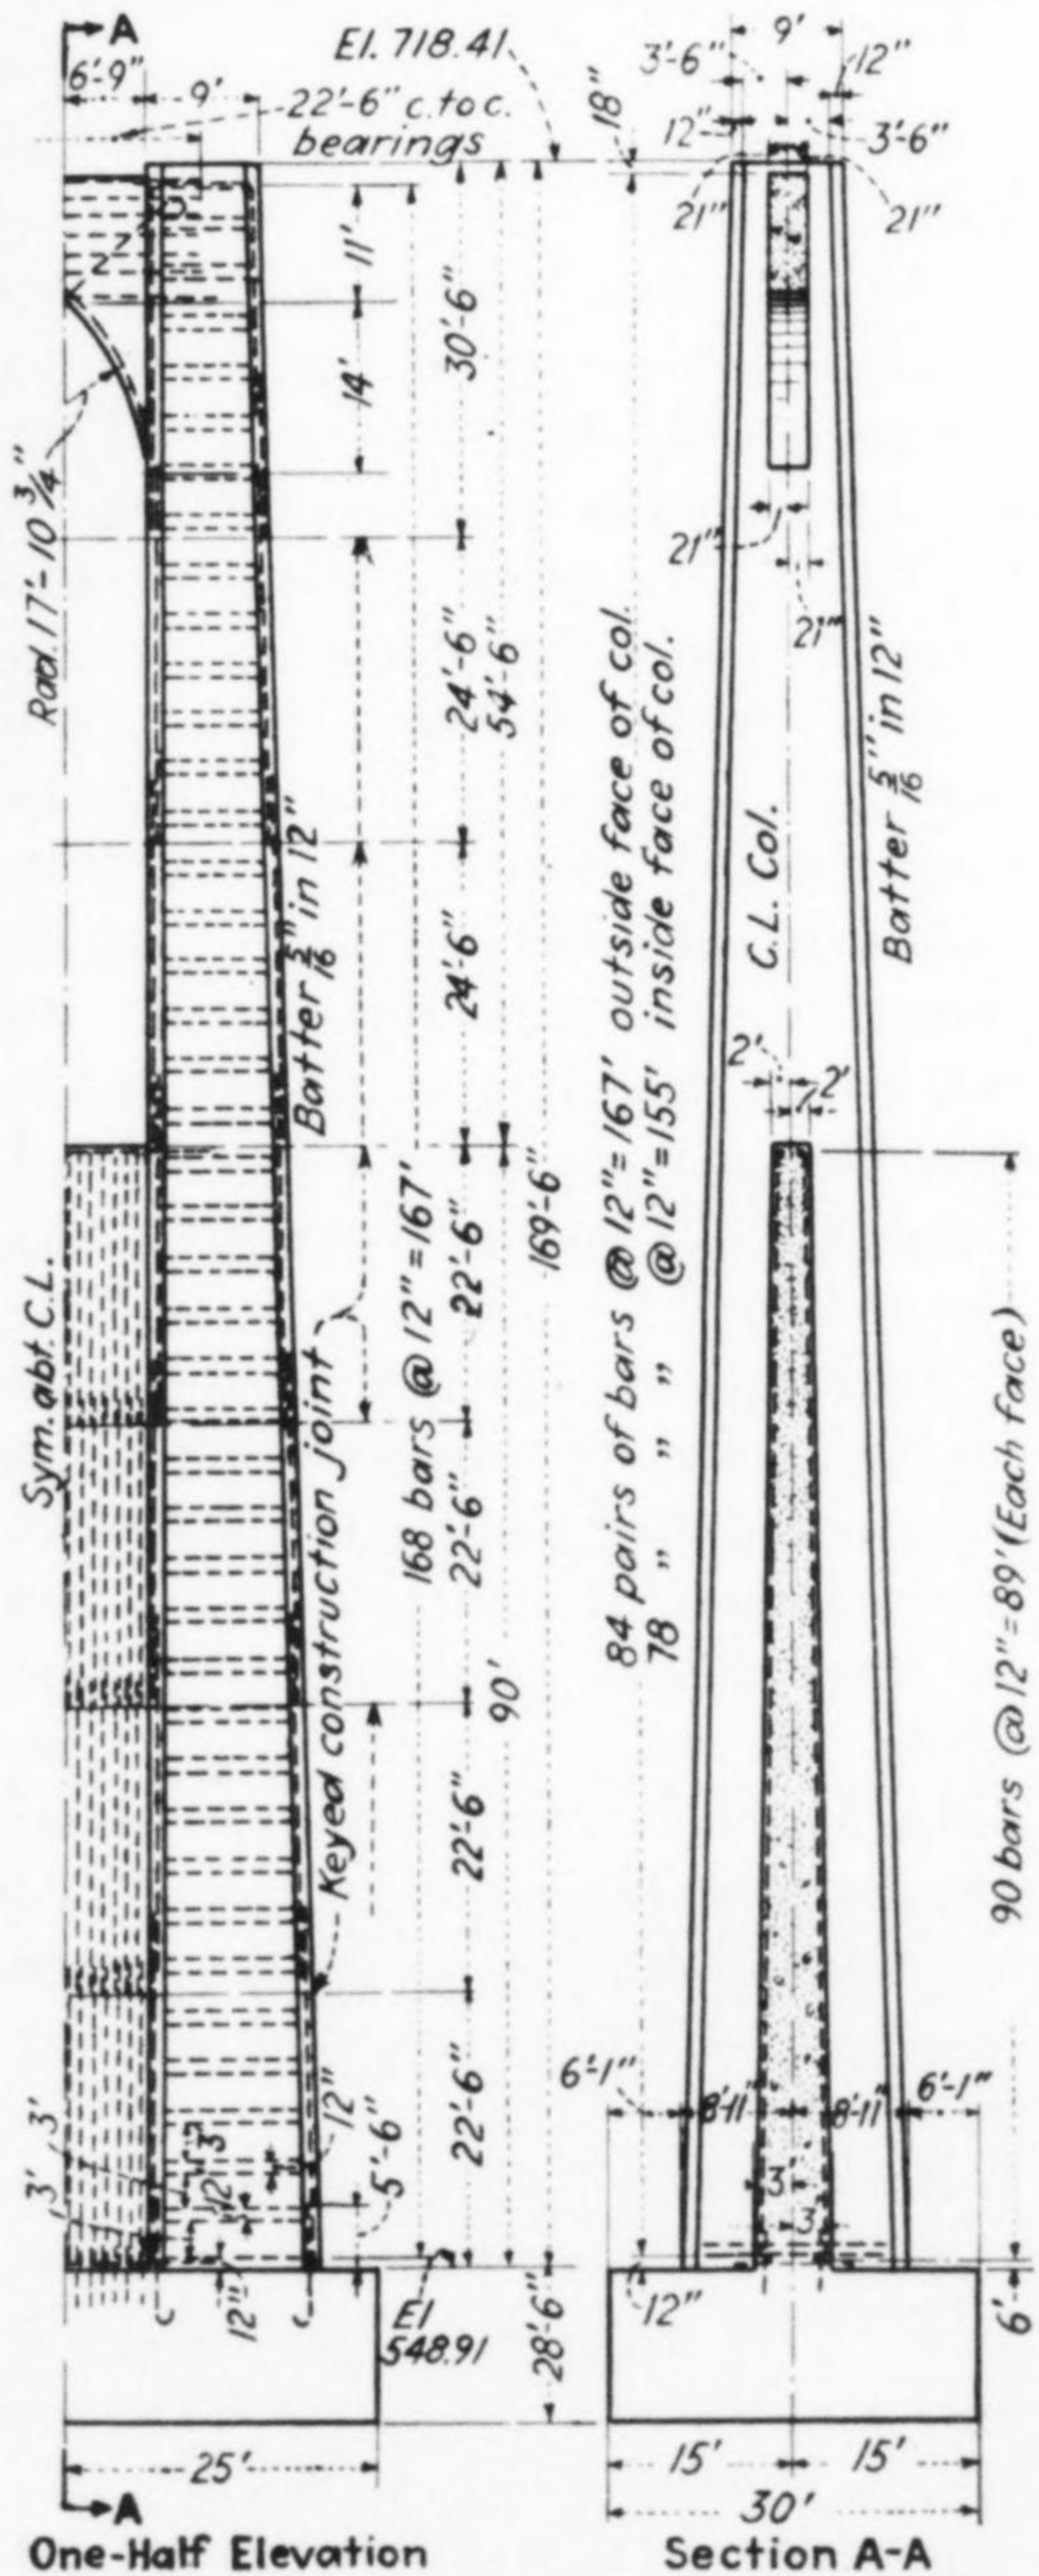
Pier 6, will be 198 ft. high and will require 3,800 cu.yd. of concrete and 172,000 lb. of reinforcing steel.
